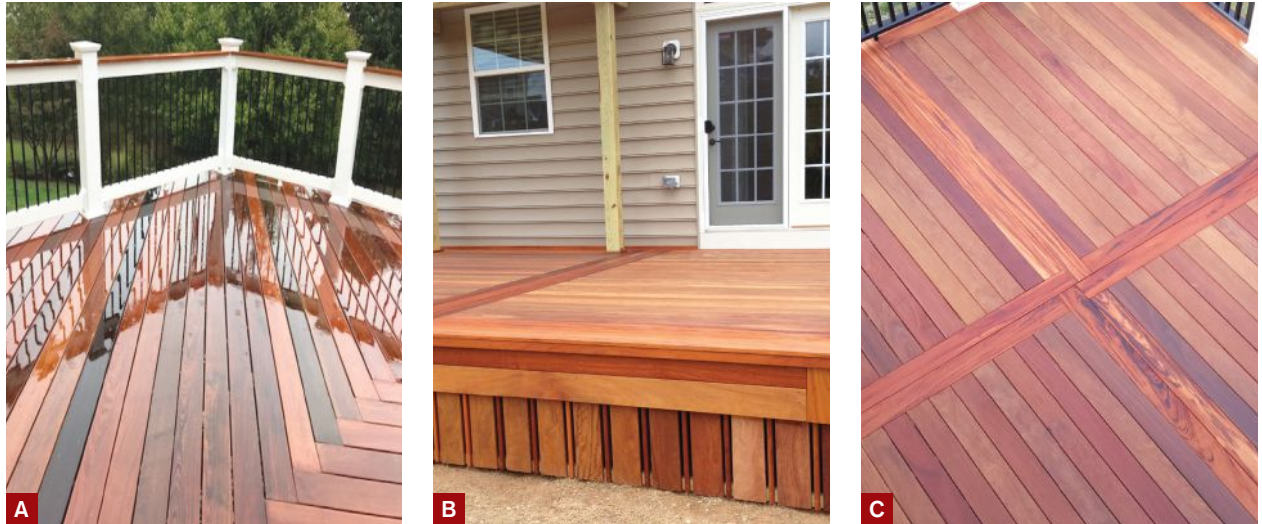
Ipe decking installed in a herringbone pattern adds an interesting twist to this wood deck's classic look (A). On a low deck (B), builder Brendan Casey framed the Brazilian teak decking with a Brazilian tigerwood inlay, fascia, and border. On another Brazilian teak and tigerwood deck, Casey installed a double picture-frame border and a matching crisscross inlay with a basketweave pattern in the center (C).
